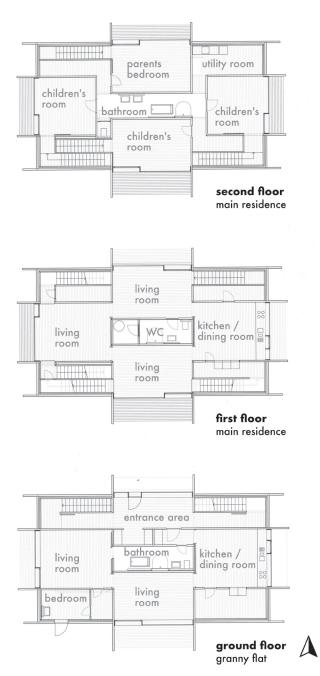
Peter Zumthor, Luzi House, Jenaz (Switzerland), 1997–2002, floor plans (source: © Atelier Peter Zumthor & Partner, Haldenstein, from: Durisch 2014a, 139, revised by H. Schiefer)
